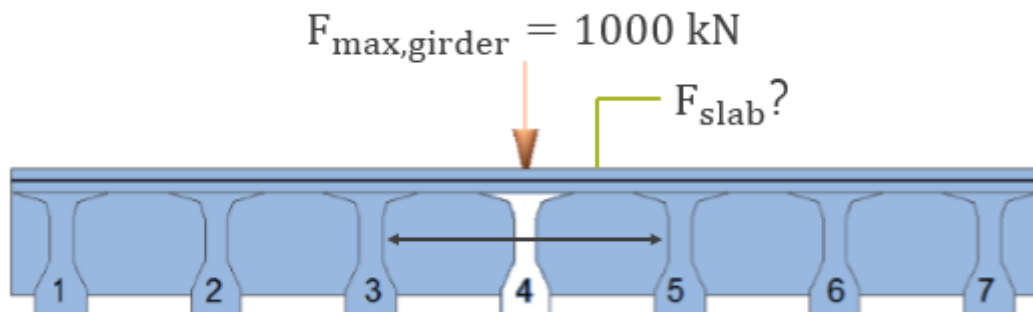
loaded beam reaches its maximum capacity; slab needs to carry the load
